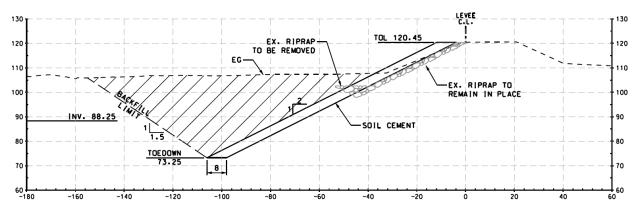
Typical Cross Section of Alternative A1 (Sta. 368+00)
